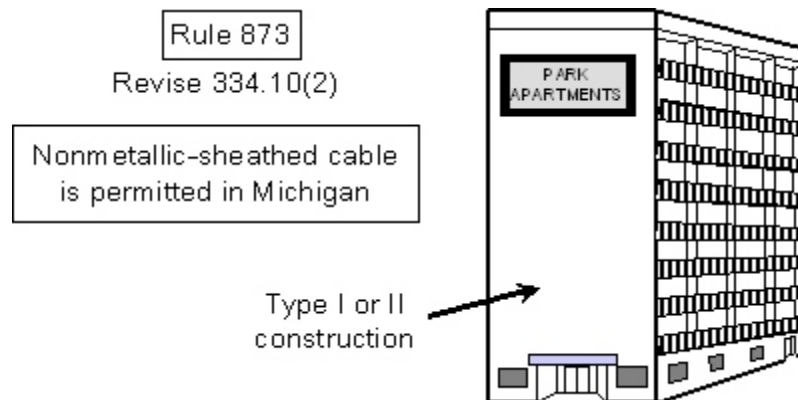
Nonmetallic-Sheathed Cable is permitted to be installed in multifamily dwellings of any type of construction in Michigan.
